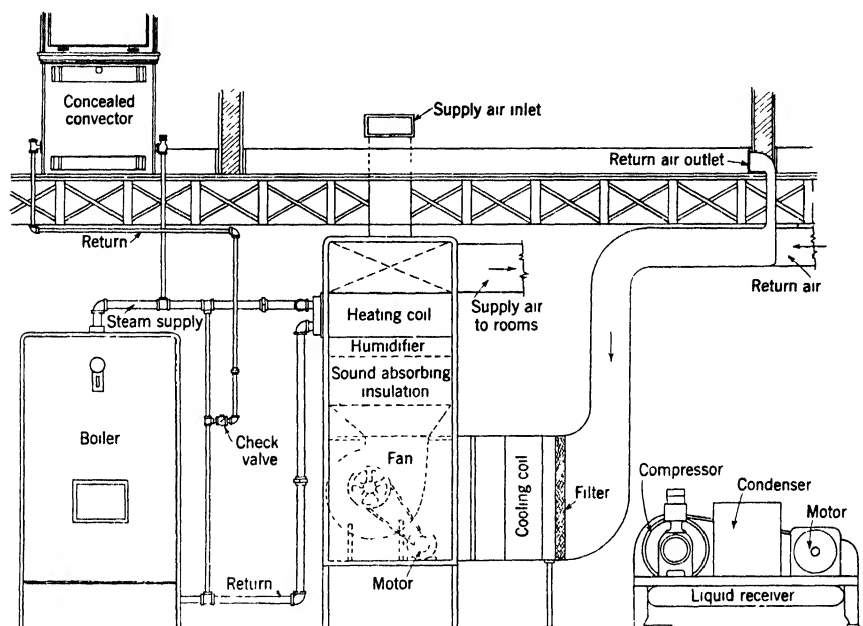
RESIDENTIAL CONDITIONING UNIT WITH STEAM BOILER
